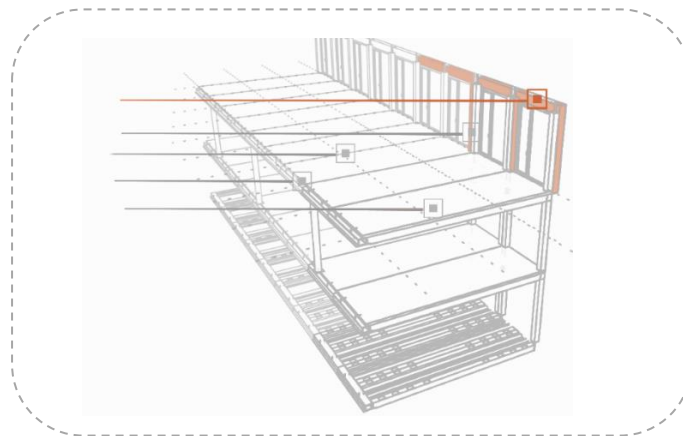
The CREE façade element. (Sustainable building systems | timber hybrid office buildings - CREE Buildings)
